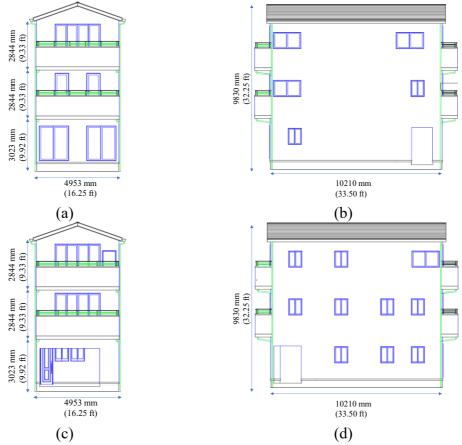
Elevation view of the building: (a) North side, (b) West side, (c) South side, and (d) East side (Aghababaei et al., 2021).
